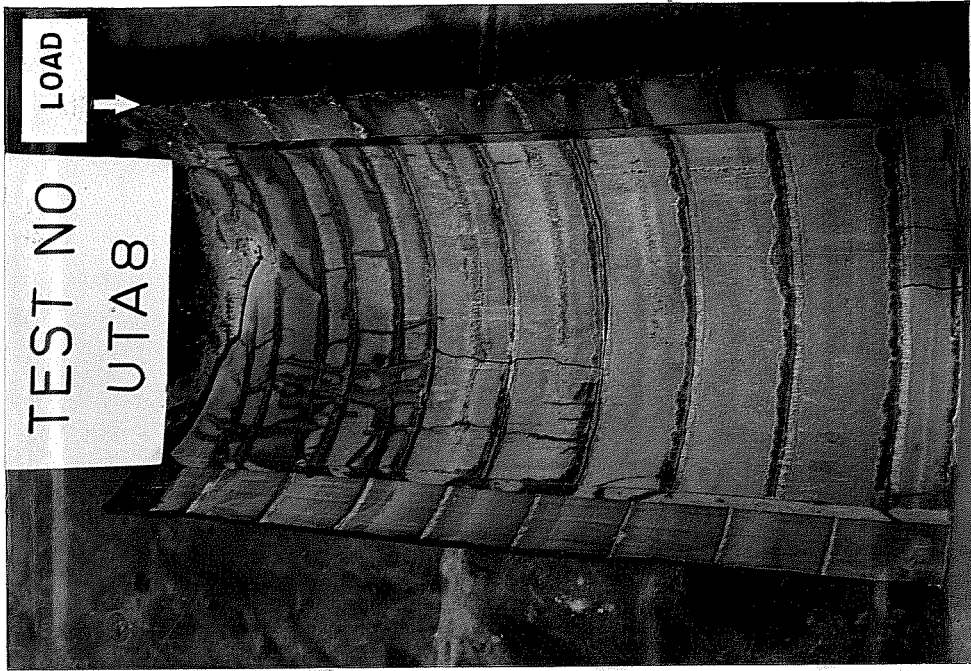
Grout surface on pile side for Specimen UTA8
